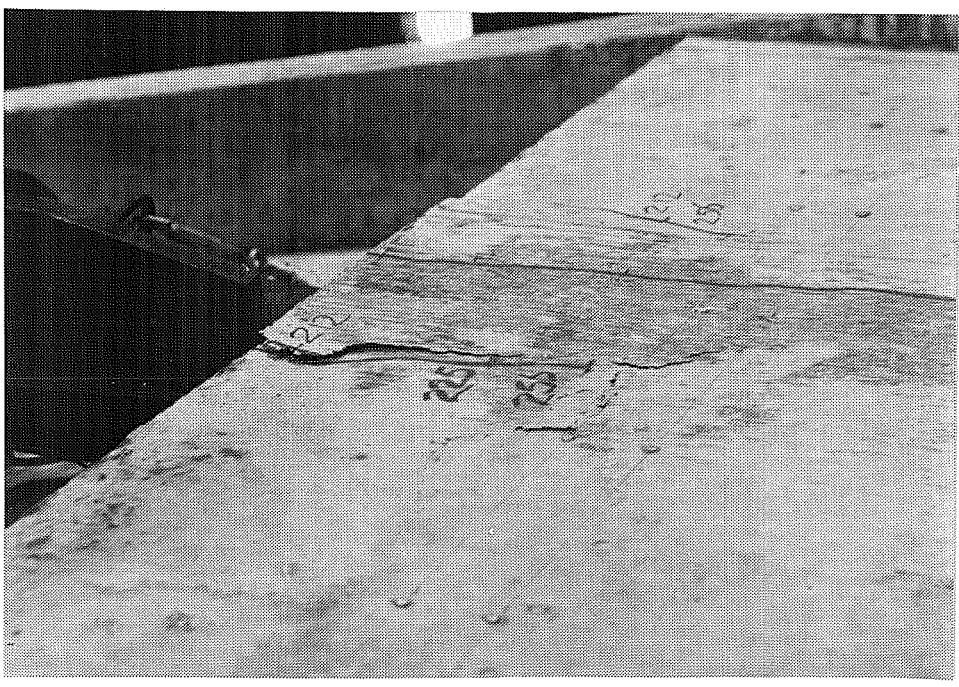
Local Zone Spalling in Specimen Blister4 at 90% of Failure Load
